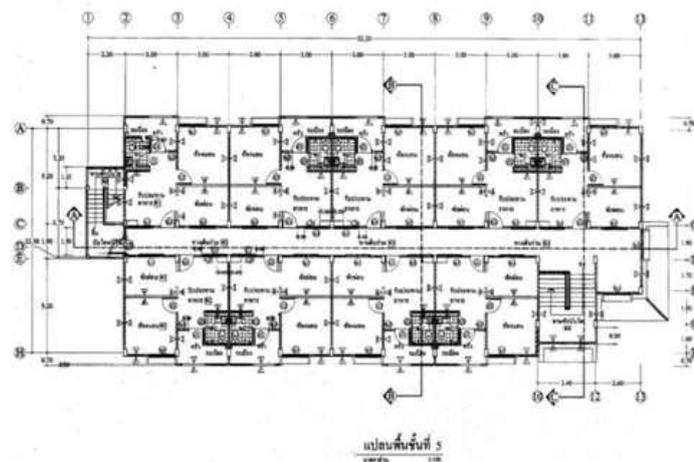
Top Floor Layout of Typical Low-Rise Condominium
